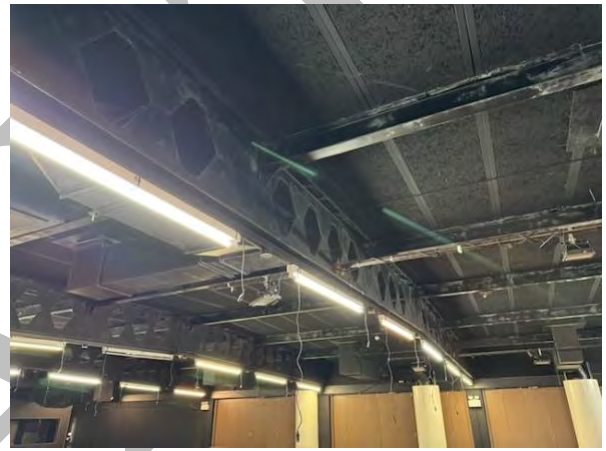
View of castellated steel beams over the auditorium and primary support to the roof.
